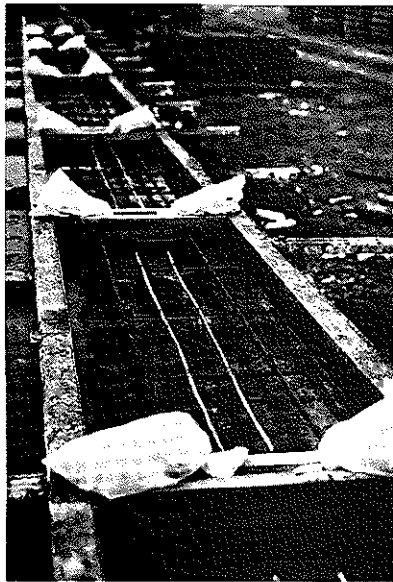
INSTRUMENTATION TUBE INSTALLED IN PANEL WITH 1/2 IN. DIAMETER STRANDS
